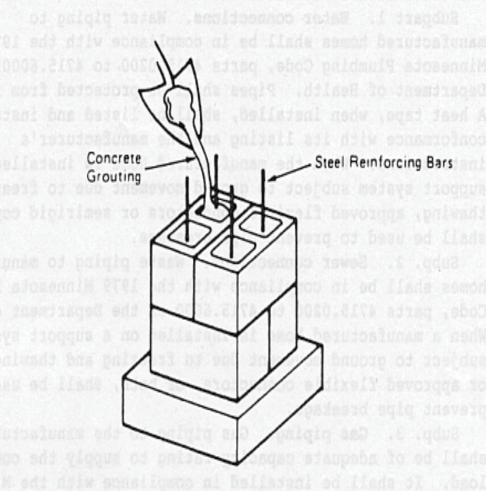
For piers exceeding 80 inches in height the concrete blocks must be filled with concrete grouting and steel reinforcing rods utilized.
